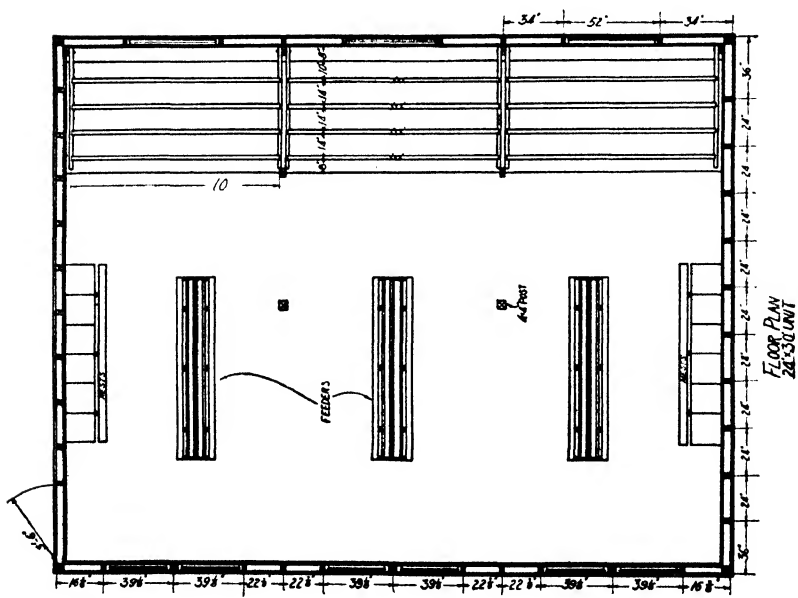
Floor plan showing location of droppings boards, feeders, and nests
